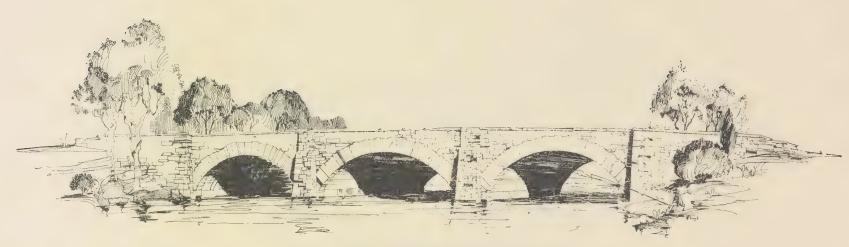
Architectural elevation of bridge over Hunting Creek
